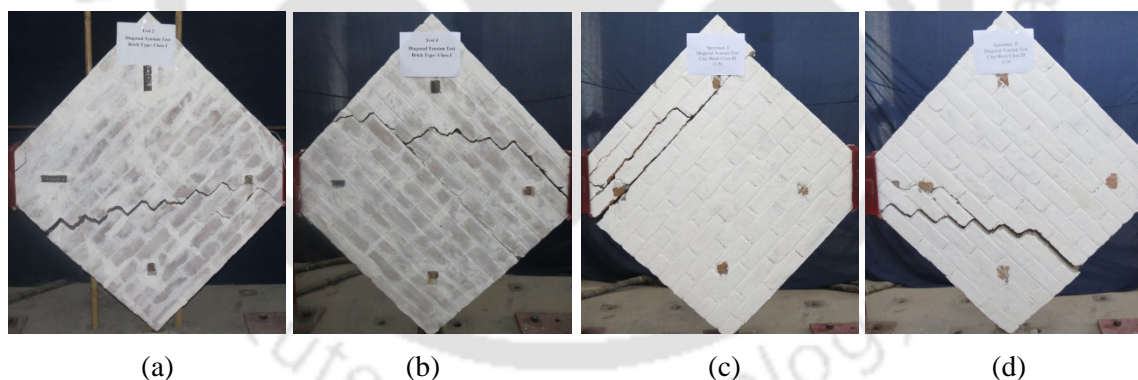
Failure mechanisms in masonry wallettes: (a) diagonal shear cracking and (b) combination of diagonal shear cracking and sliding of bed joint in class-I clay brick masonry; (c) bed joint sliding and (d) combination of diagonal shear cracking and sliding of bed joint in class-III clay brick masonry.
